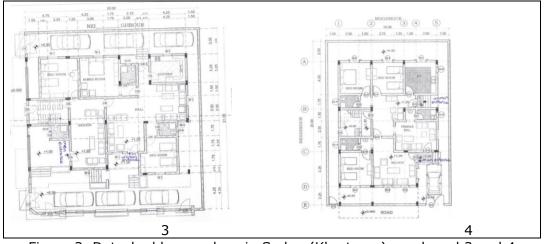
Detached house plans in Sudan (Khartoum) numbered 3 and 4
